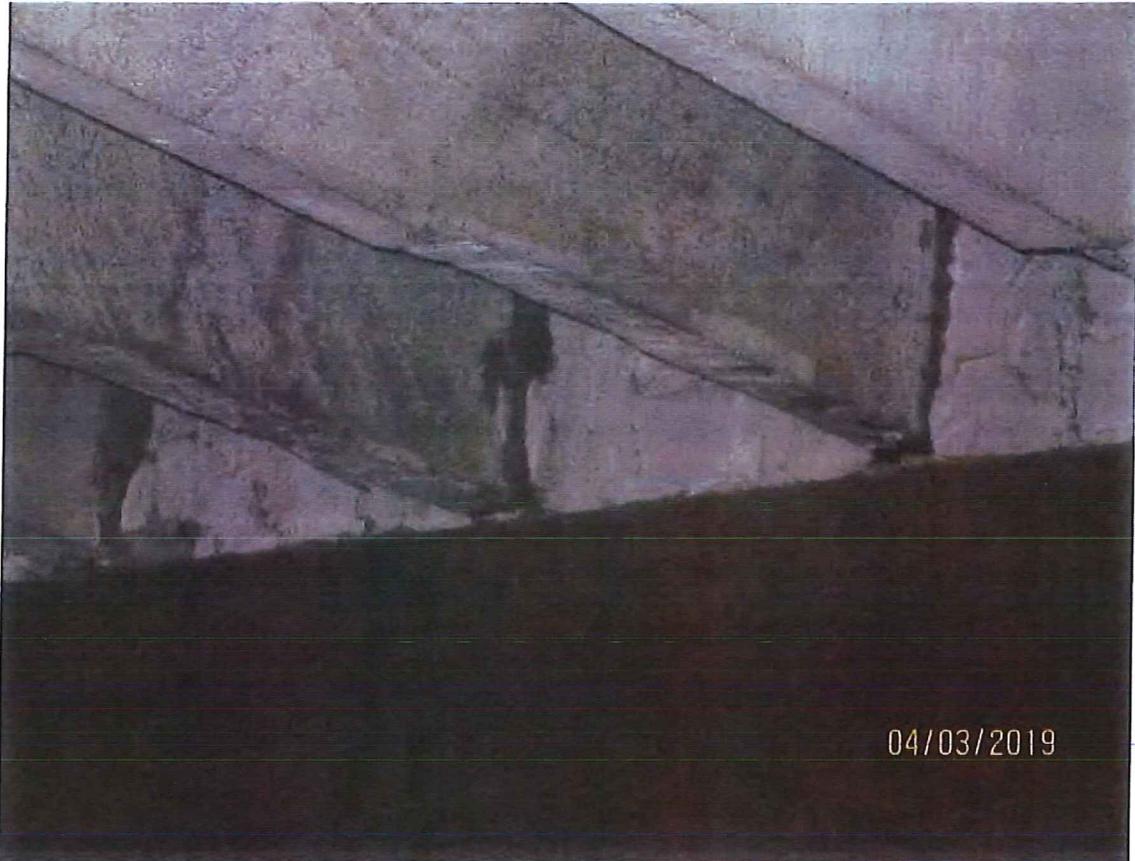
Typical wall movement at left sidewall on third floor.
